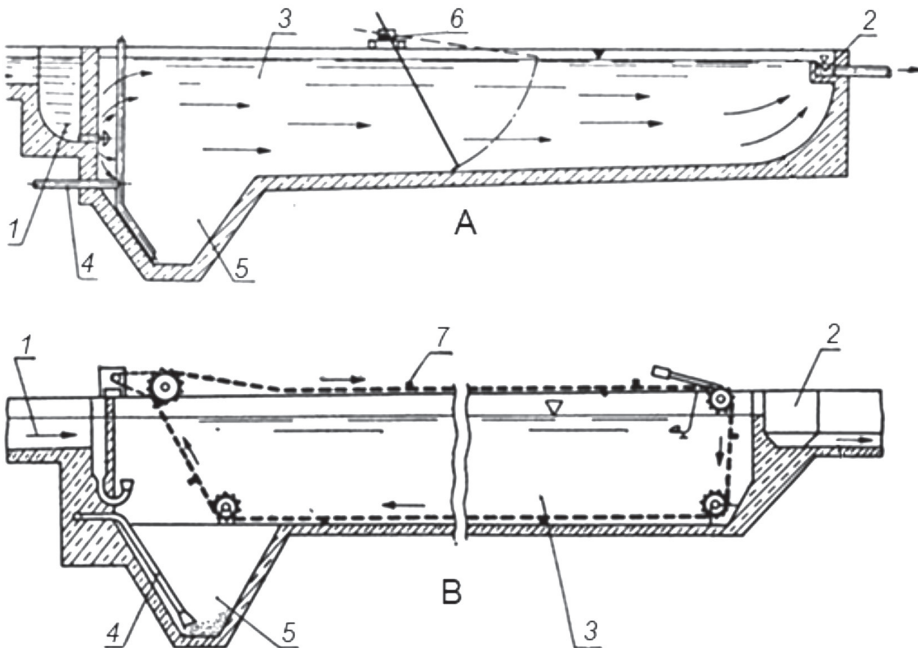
Horizontal-flow rectangular setting tank with travelling bridge scraper (A) and chain scraper (B).
